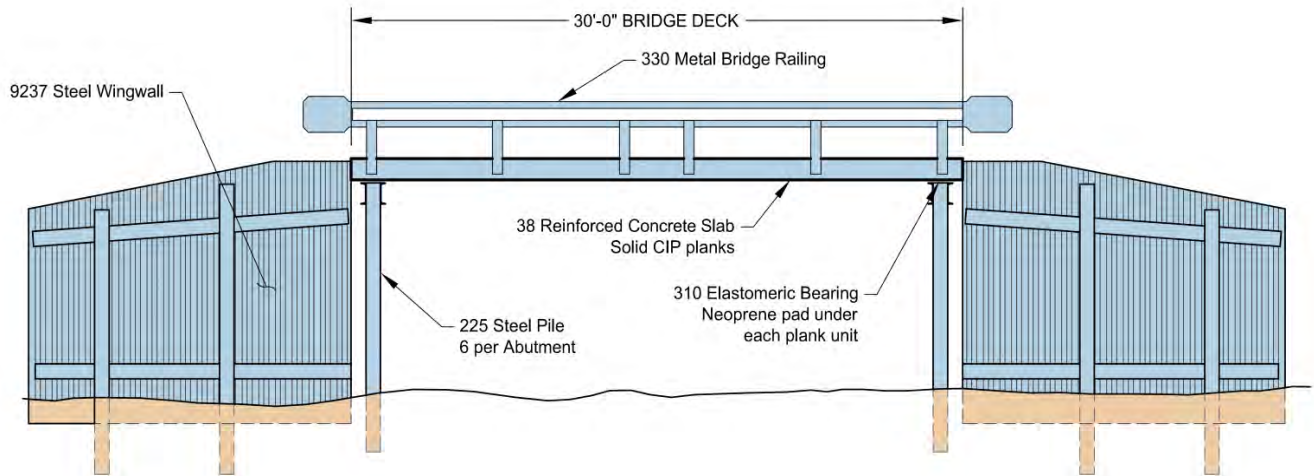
EI.24.2-1: Elevation view of simple concrete slab bridge
